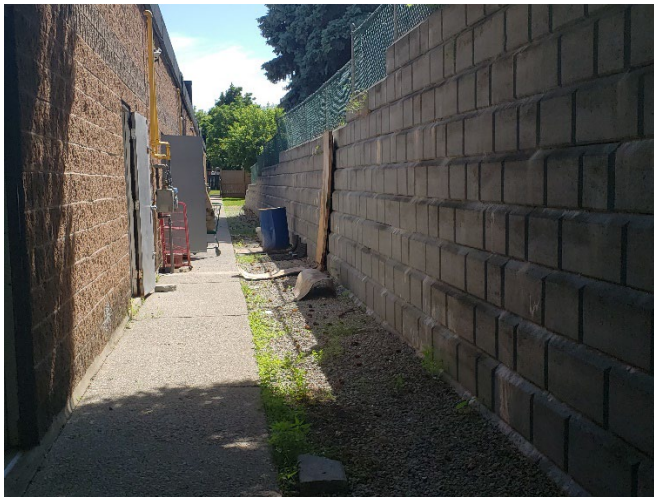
View of northwest side of 801 Dundas St E building, from northeast
